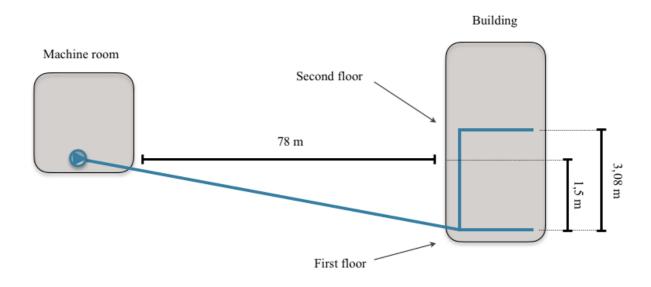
Schematic of the pipe connecting the building to acclimate and the machine room
